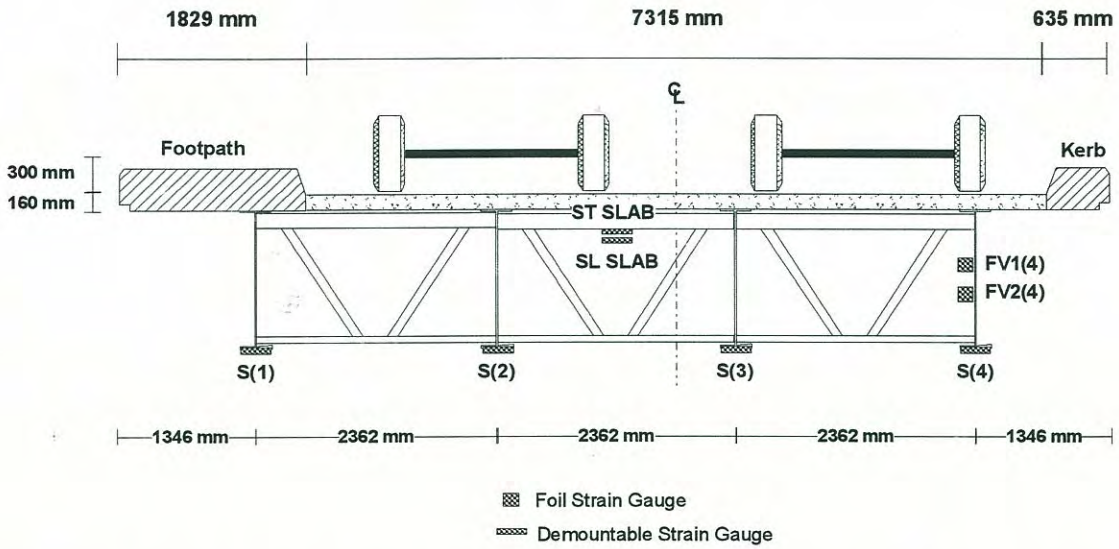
Cross section of structure showing instrumentation and vehicle lane positions.
